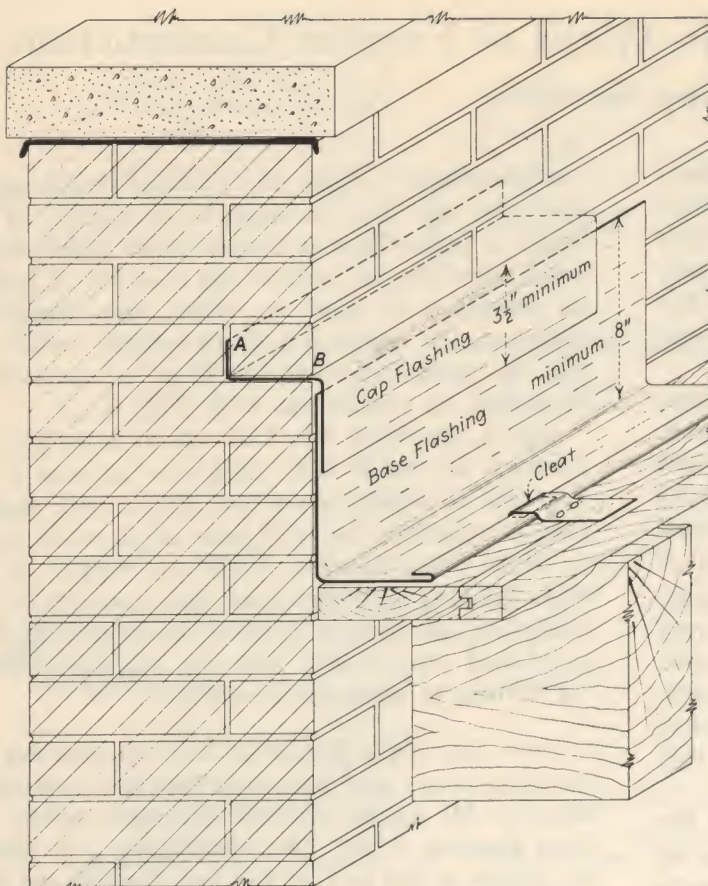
BASE AND CAP FLASHINGS JOINING A BRICK WALL
